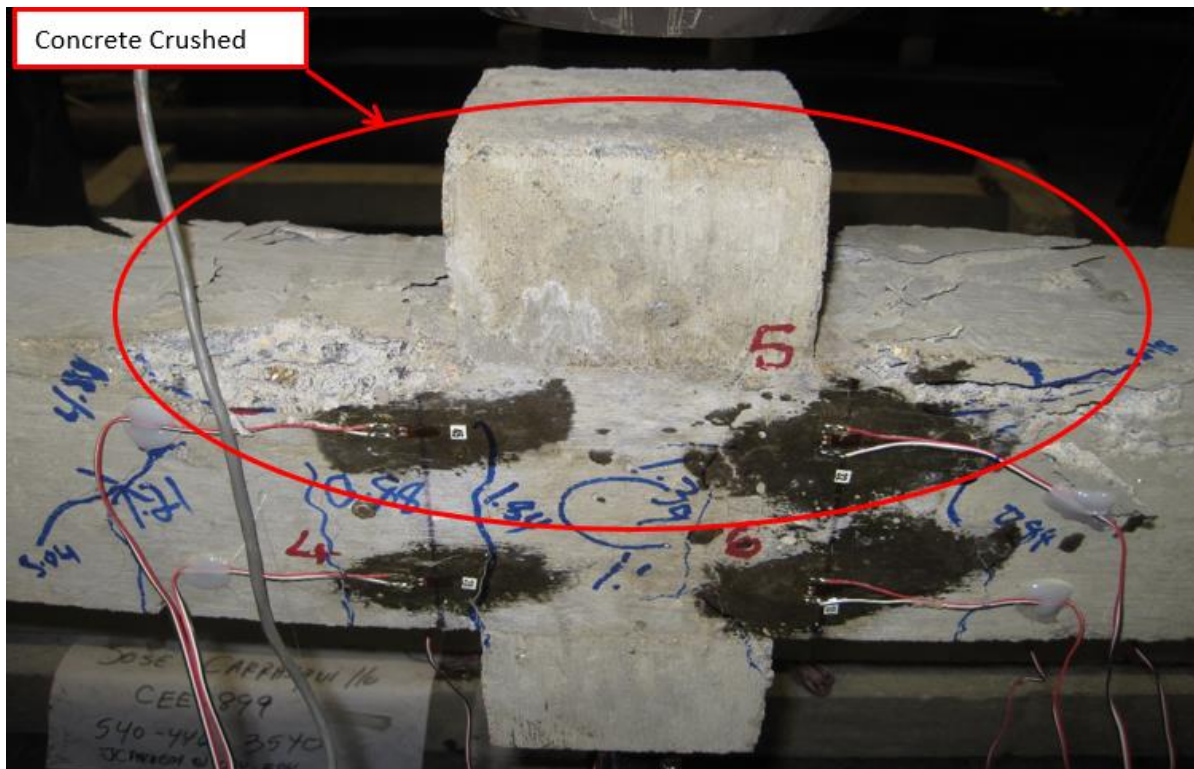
Missing Column Crack Pattern at the Collapsed Load for Specimen B2-2
